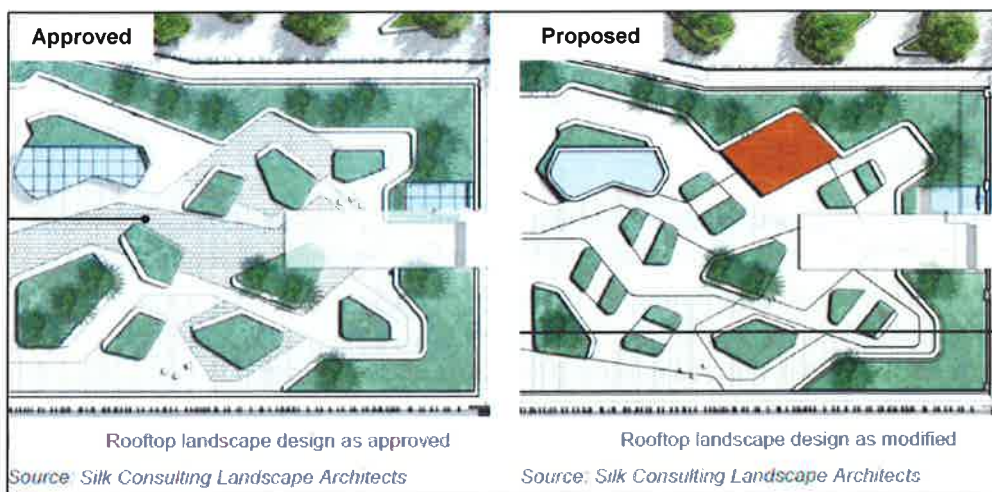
Approved and modified rooftop landscape design (Source: Applicant's Modification 1 EIS)
